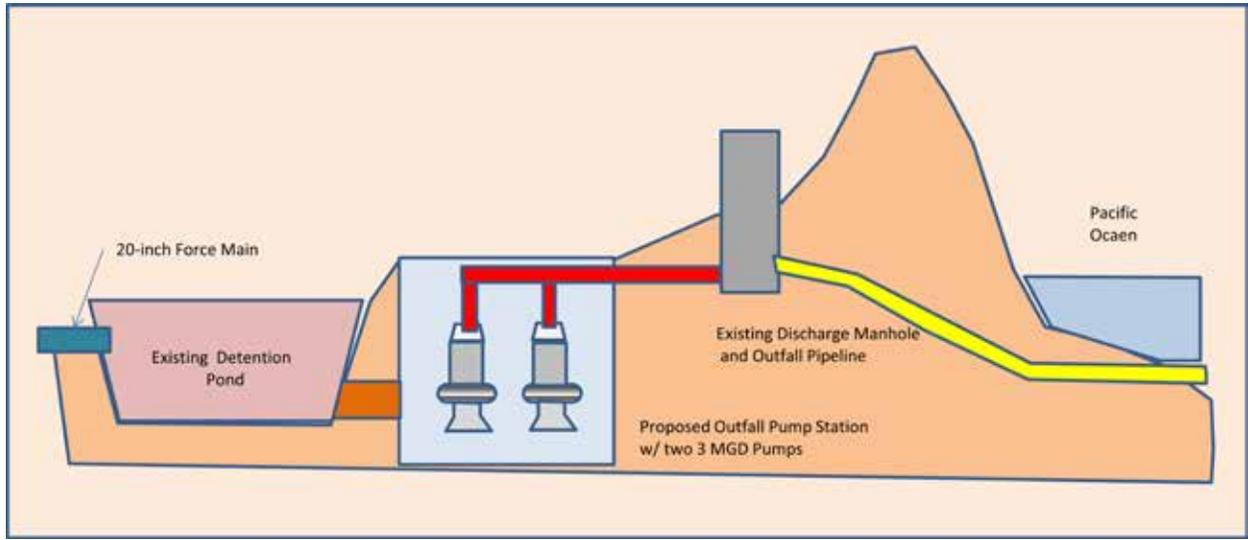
Detention Pond, Outfall Structure and Outfall Pump Station
